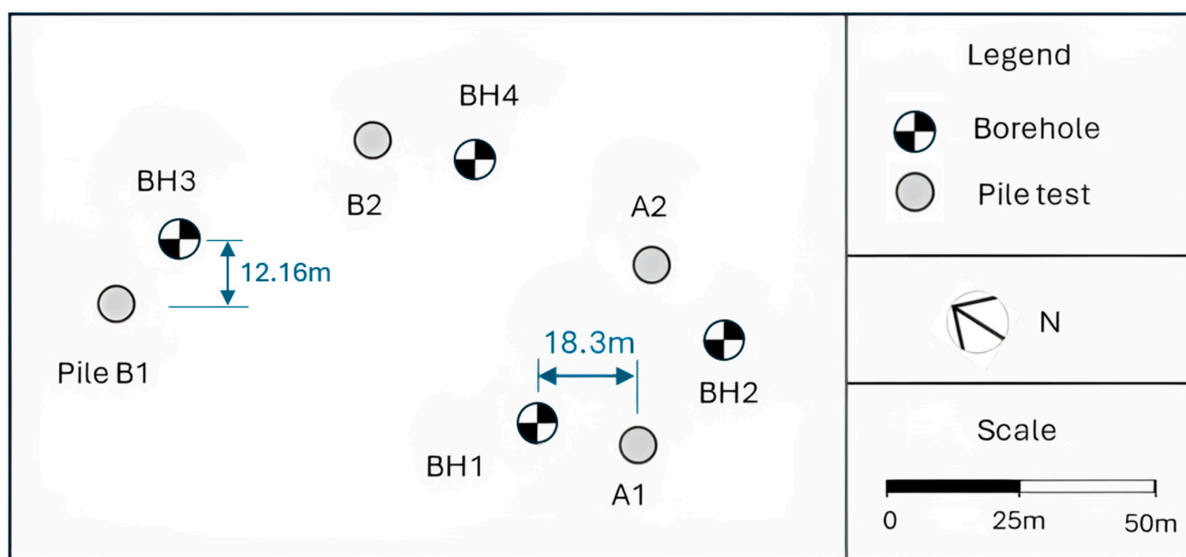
Site layout showing pile test locations and borehole positions for site investigation.
